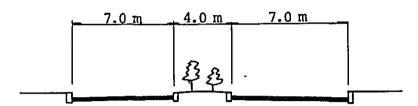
TYPICAL CLOSS SECTION OF EXISTING ACCESS ROAD
